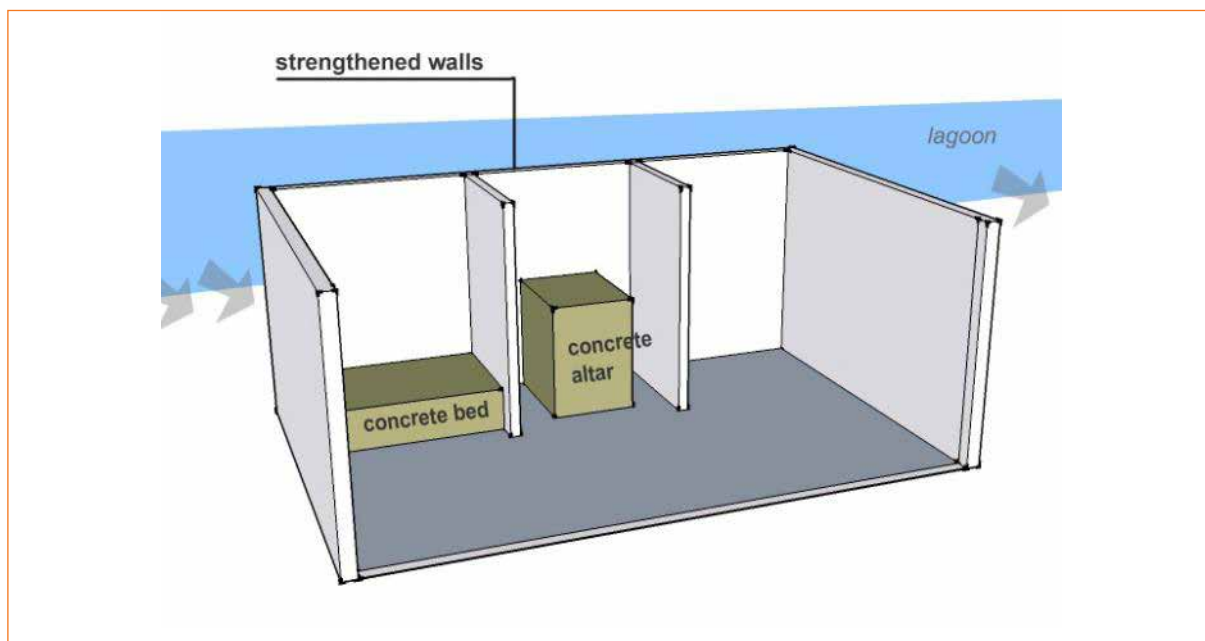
Reinforced concrete beds (left) and altars (right) were found in all surveyed houses
